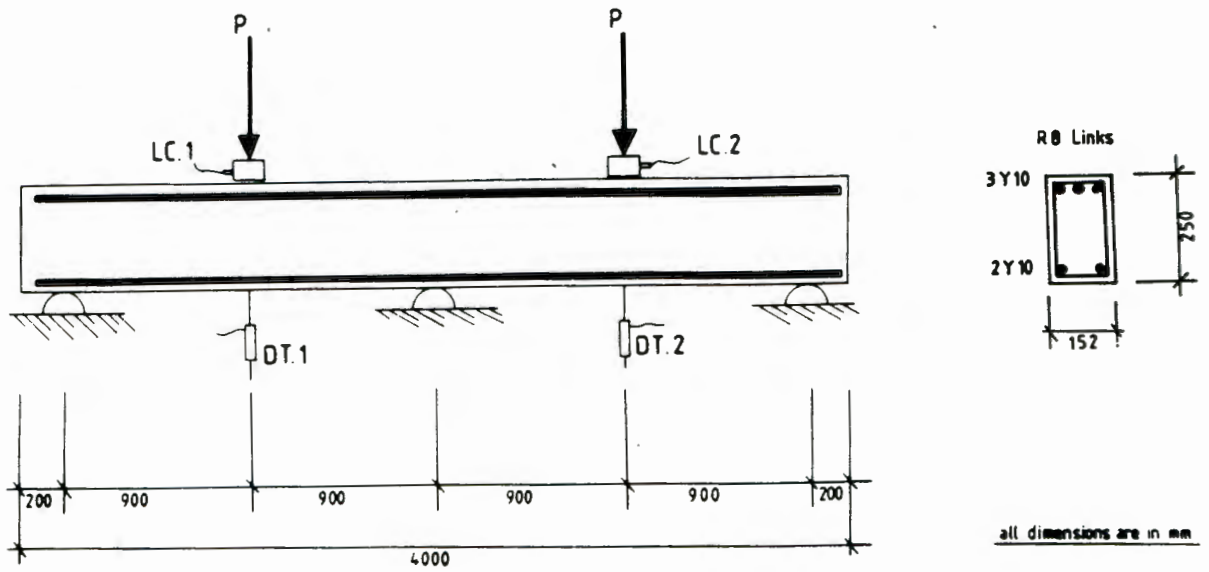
Two-Span Beam of Set 1 and Set 2.
